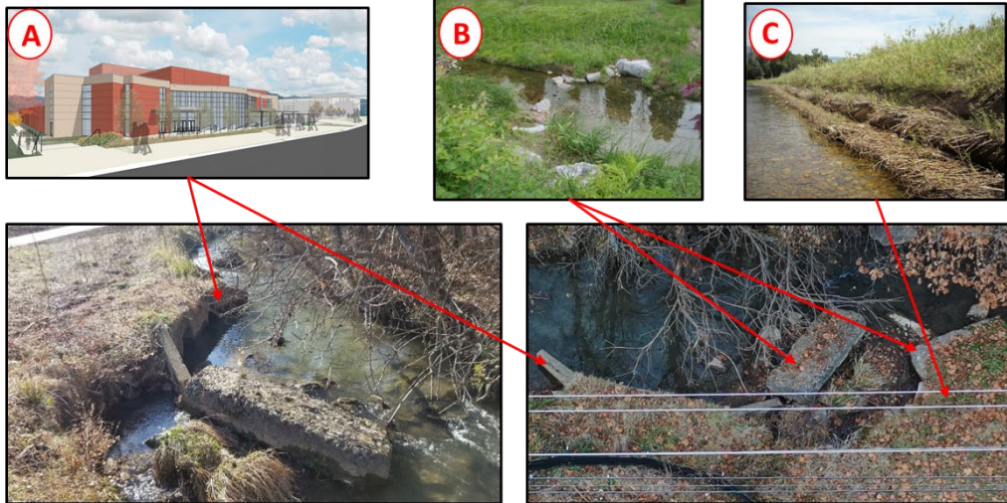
Site 1: culverts and concrete blocks. A: ETSU Fine Arts Center culvert. B: Concrete structures causing bank erosion will be reused in a cross-vane. C: 2:1 slope bank shaping to be implemented on the south bank.
